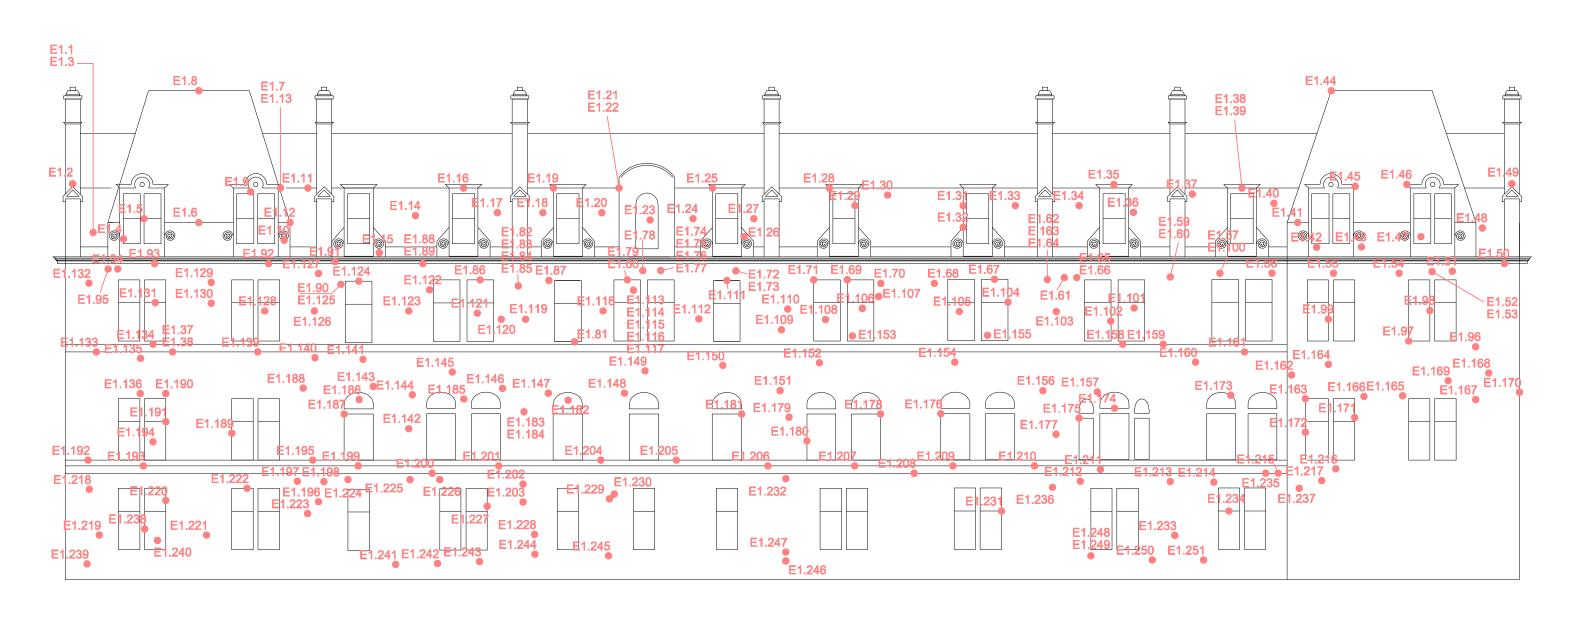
Elevation E1 of Station Hotel Building showing Defect/Observation Locations
